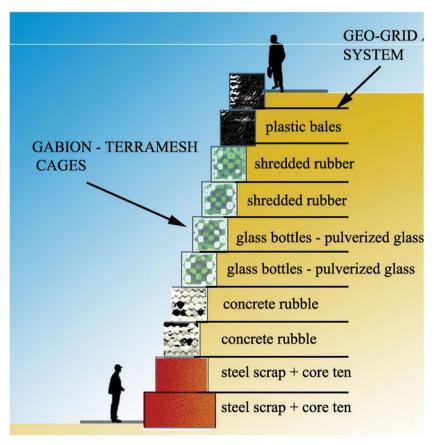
Proposal. Bruce Levin. Source: Bruce Levin K.S.M. Landscape Architects.
